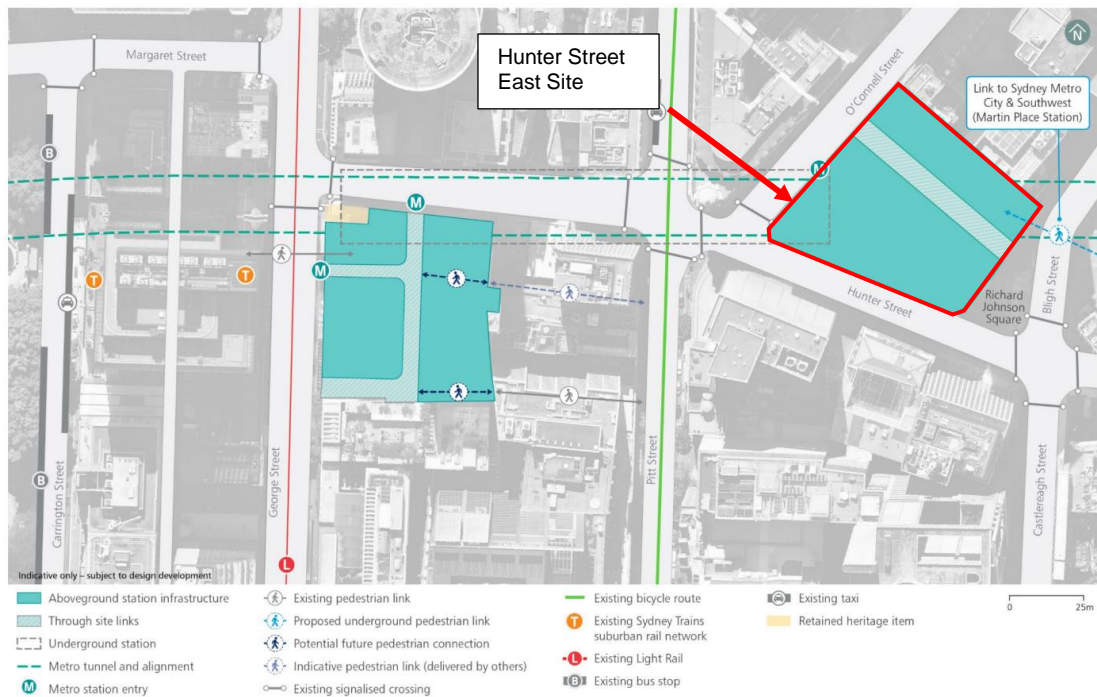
Indicative layout and key design elements – Hunter Street Station
